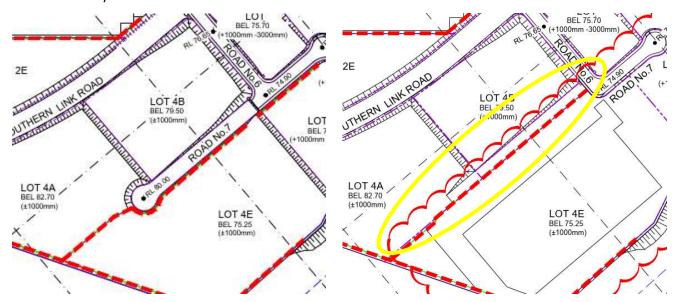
Lot 4E – Previously Approved Modification No. 6 Retaining Wall Plan (left) and Modification No. 7 Retaining Wall Plan (right)
